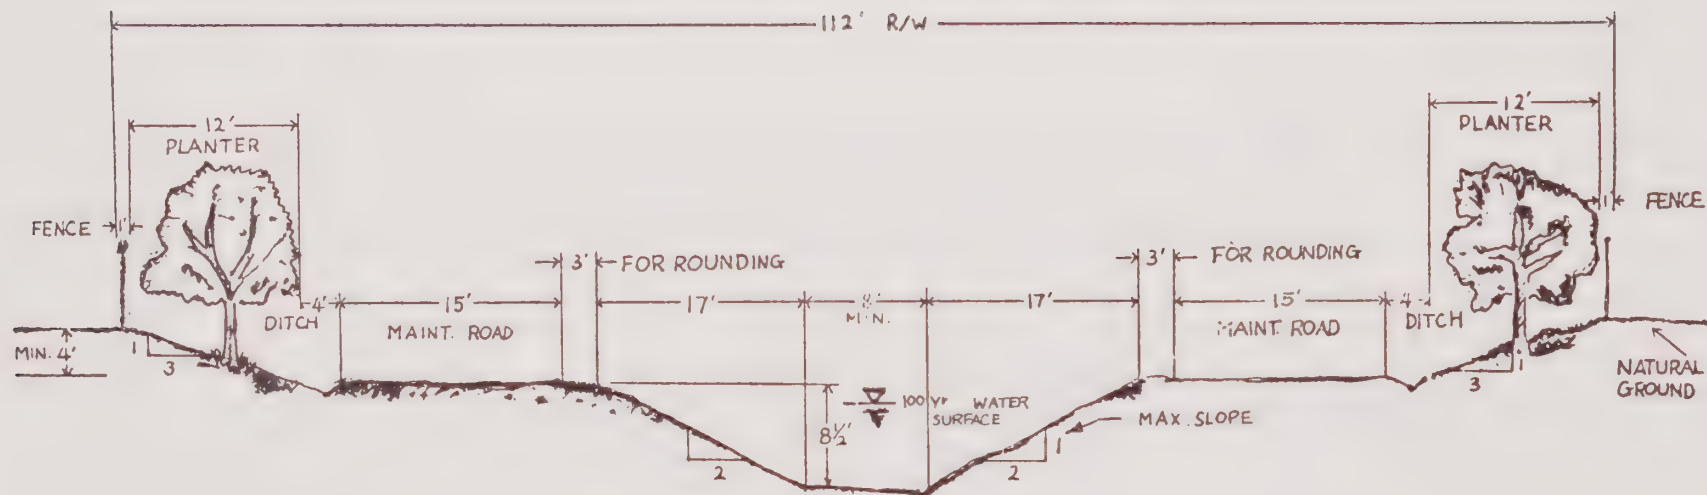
TYPICAL SECTION FOR TRAPEZOIDAL CHANNEL WITH 4-FOOT DEPRESSED ROAD
